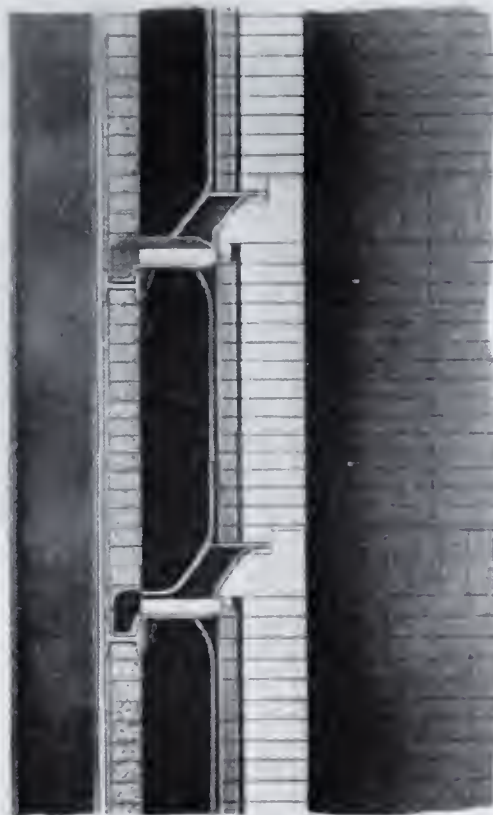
Enlarged Section Showing Detailed Arrangement of Suspended Wall.
